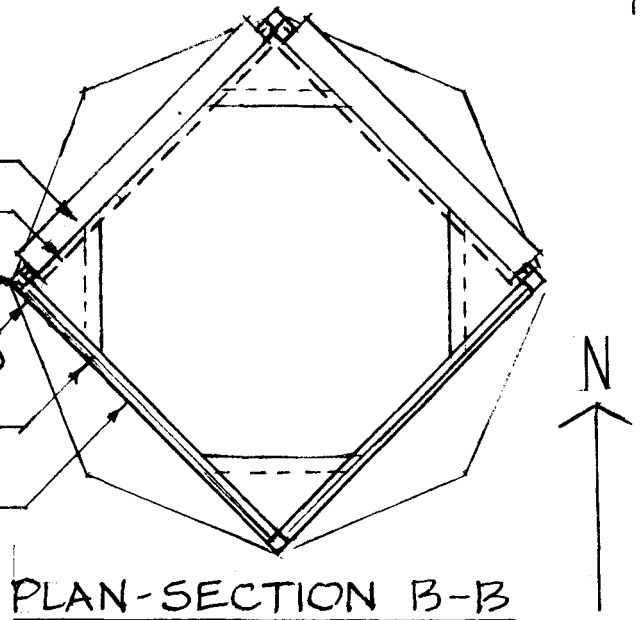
WIND TOWER (STEEL-FRAMED SECTIONS) ALT. #2
